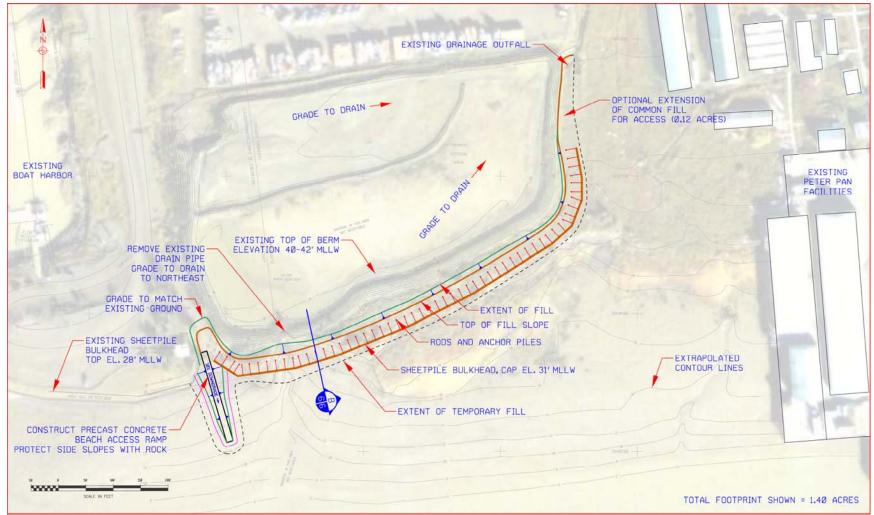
, Alternative C2 – Sheetpile: Project Plan/Site Map
